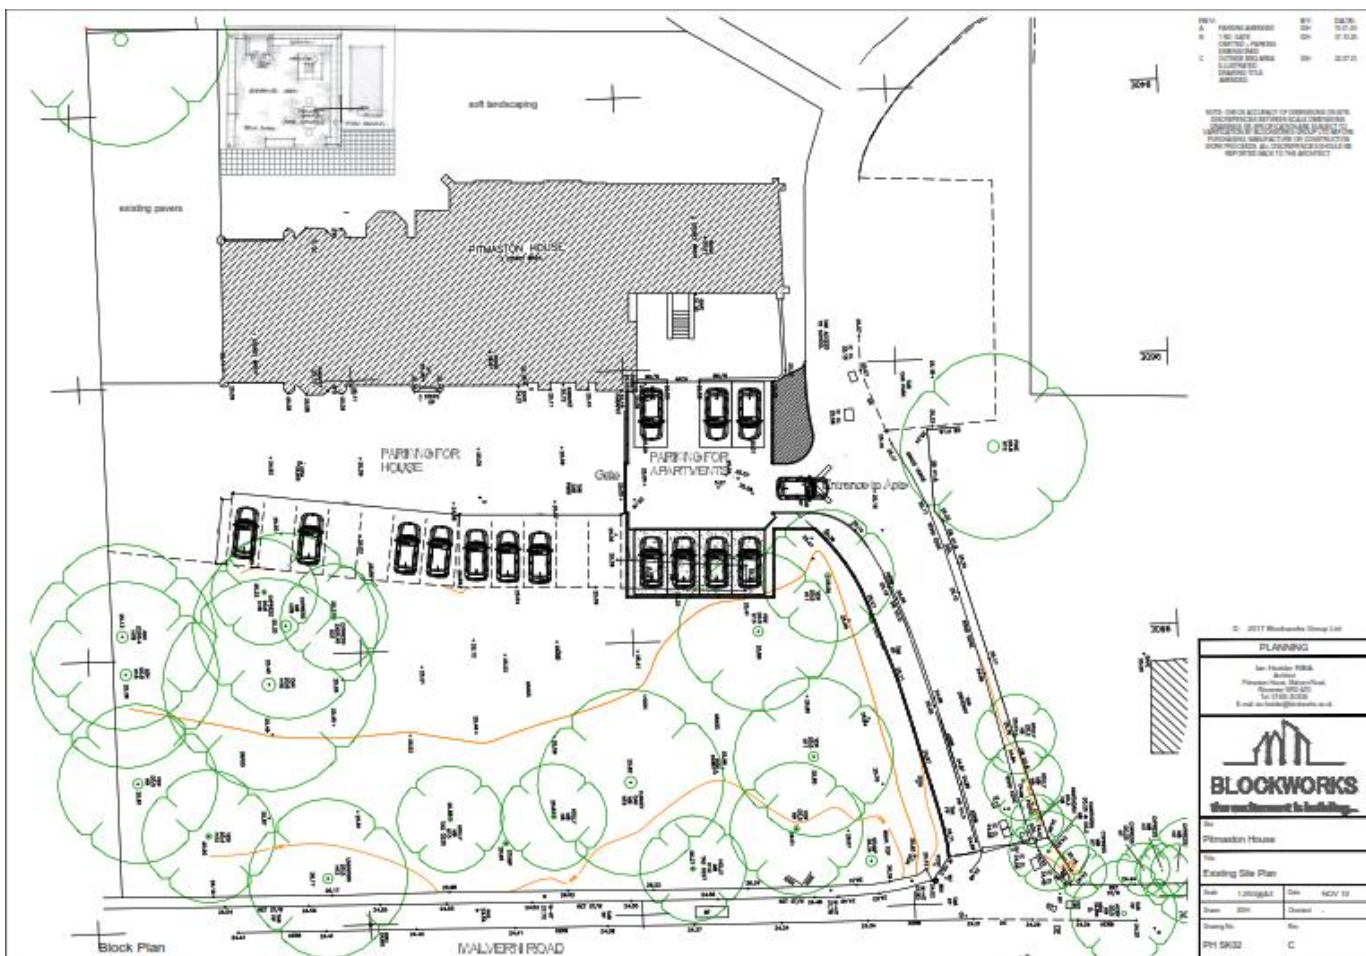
Existing Site Block Plan (Drawing No: PH SK02 Rev: C)
